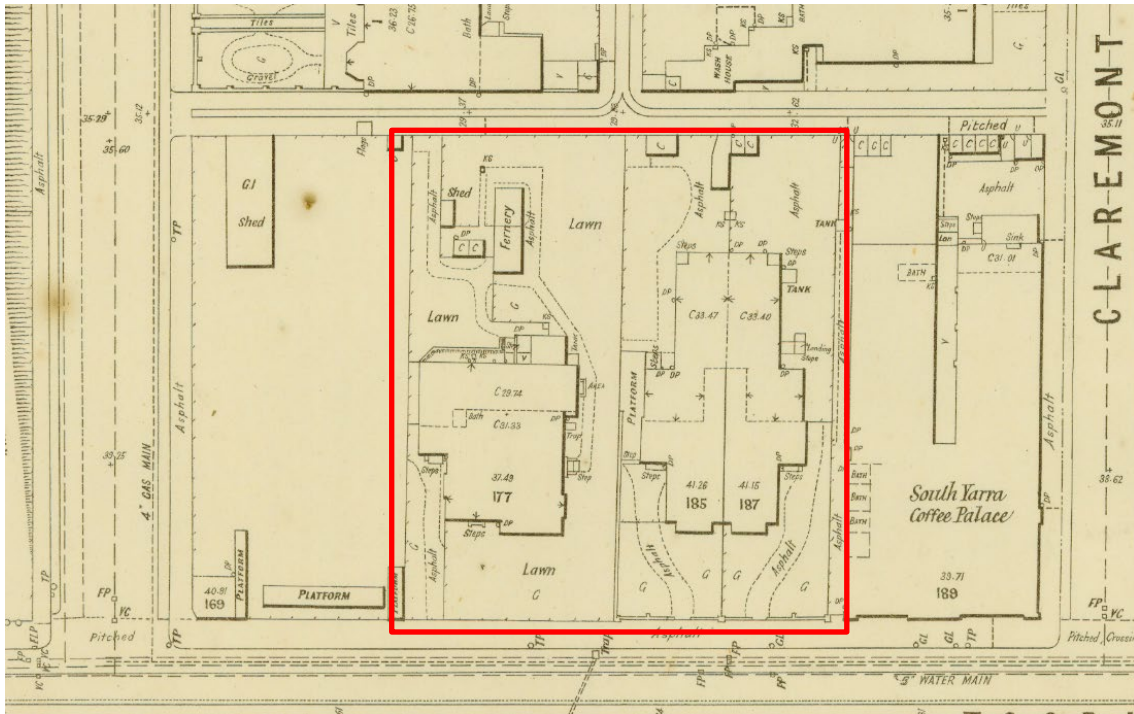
MMBW Detail plan no. 945 from 1896 with the subject site indicated
